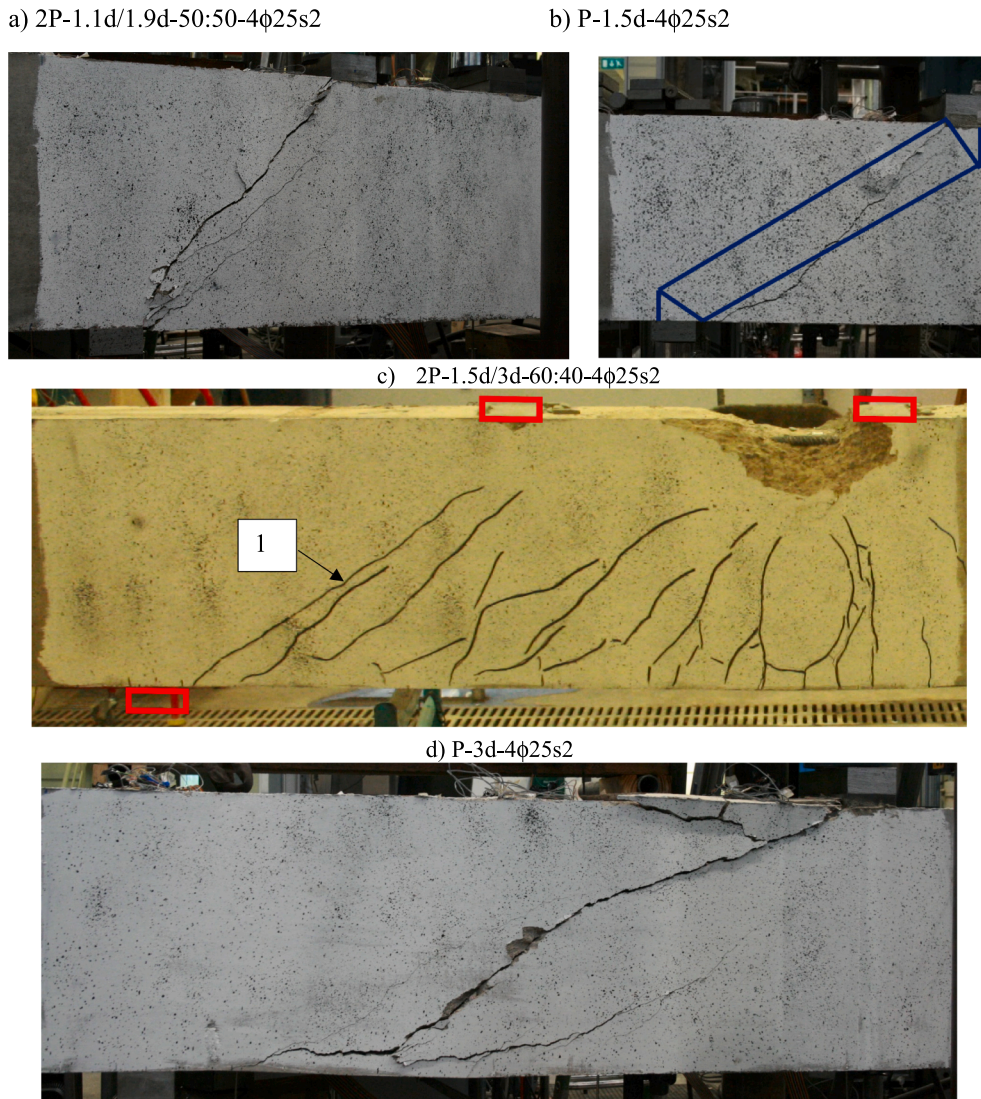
Final crack patterns for beams of Series 1 with 8-mm stirrups at 200 mm centres.
